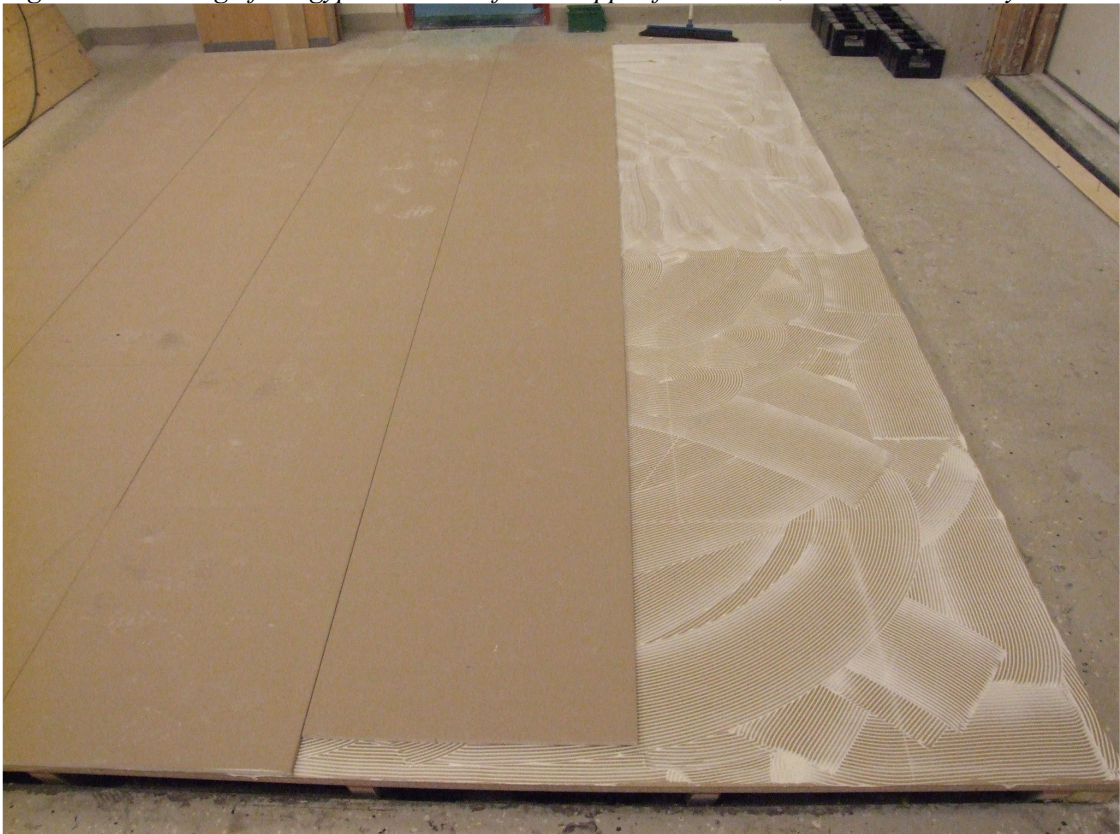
Building of upper floor called P12 (with p12 sylomer) on the clean version of the wooden floor structure.
